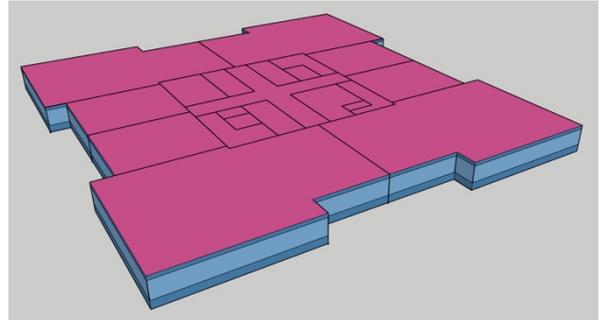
Base Design Model: Ceiling and Floor Set as Adiabatic
